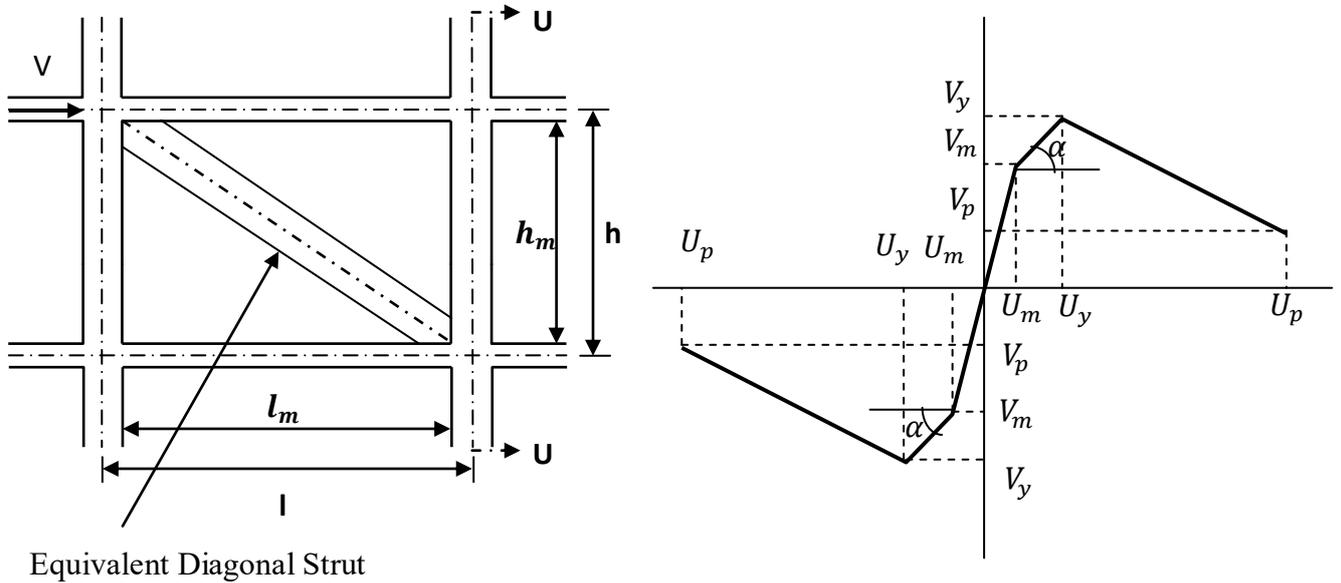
Strength envelope for conventional masonry infill walls and analytical model (Mostafaei and Kabeya, 2004)
